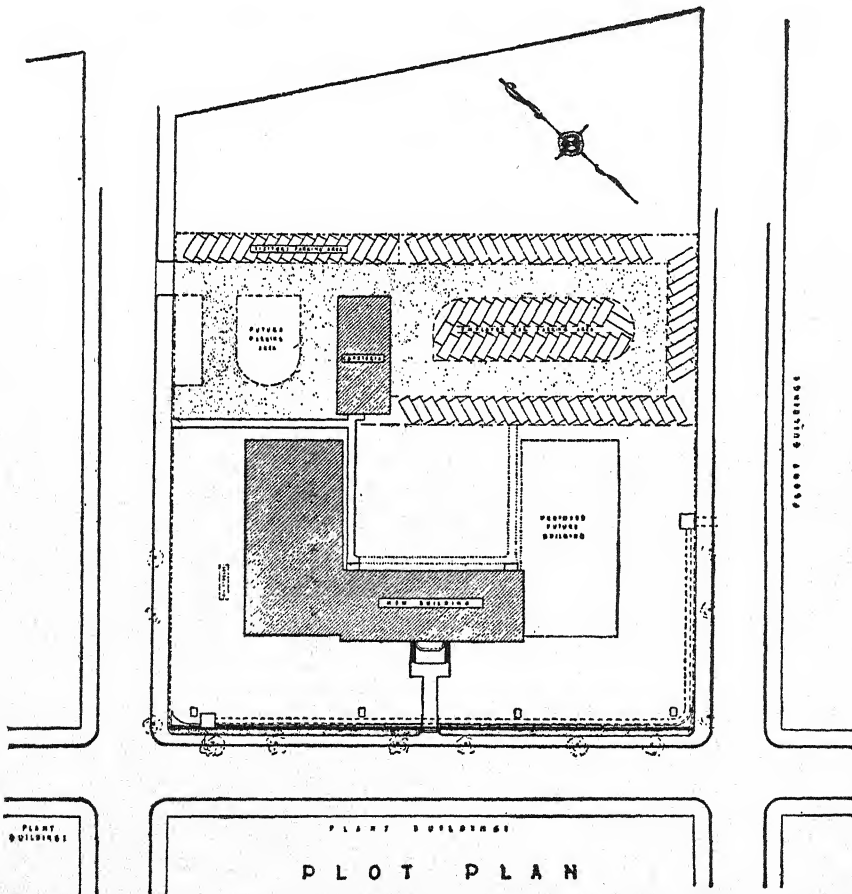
Plot Plan—preplanned growth of a building on the side grounds
